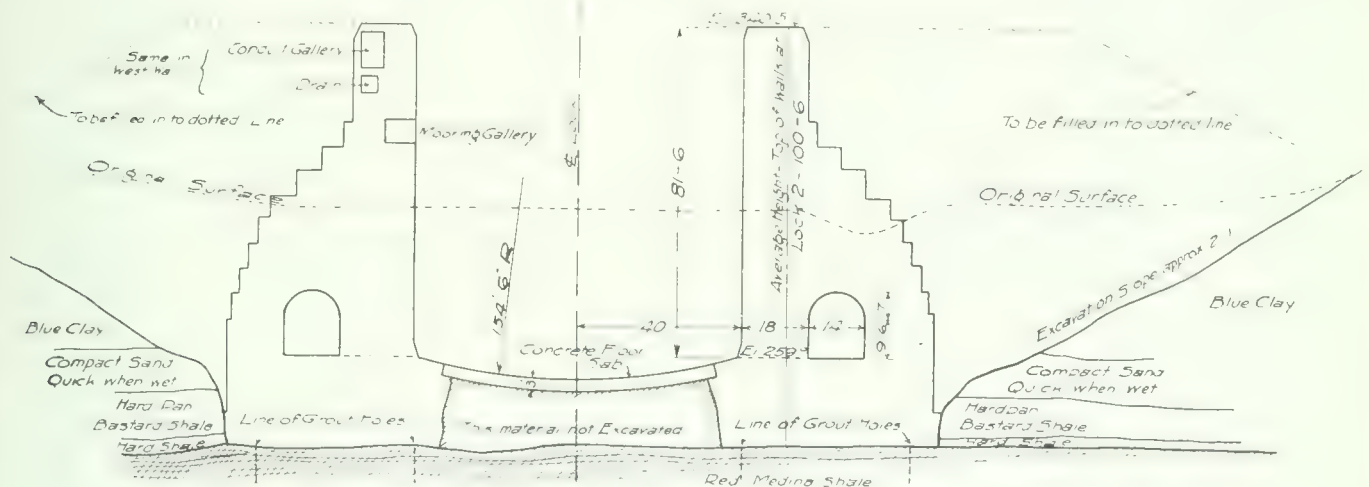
Typical General Section Through Excavation and Walls of Lock 2, Welland Ship Canal.
